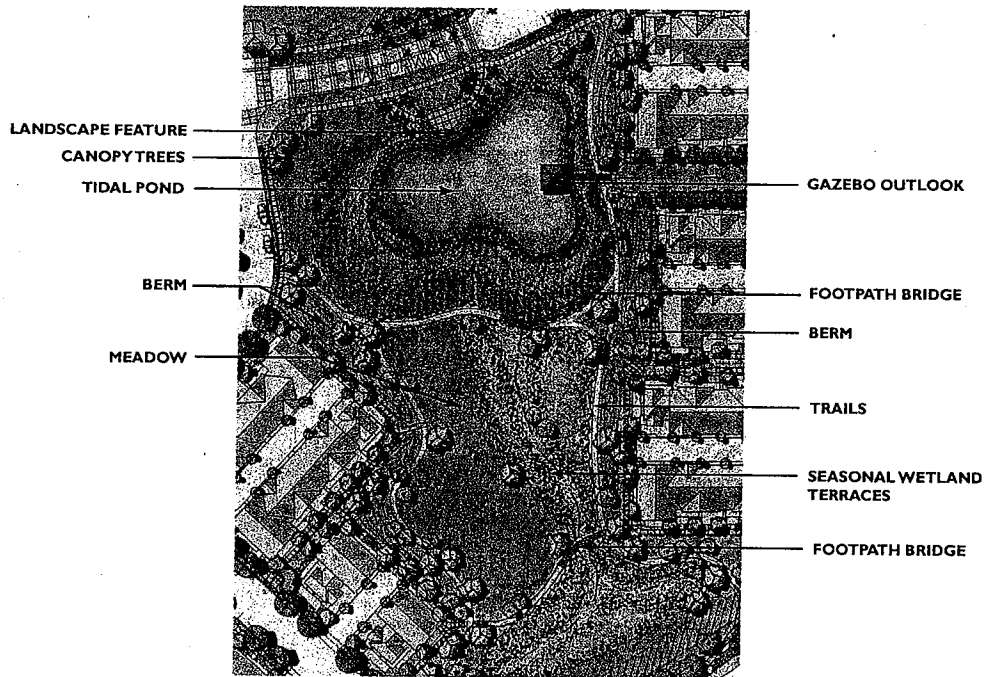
D.New.d: Plan View of the Proposed Wetland Park
